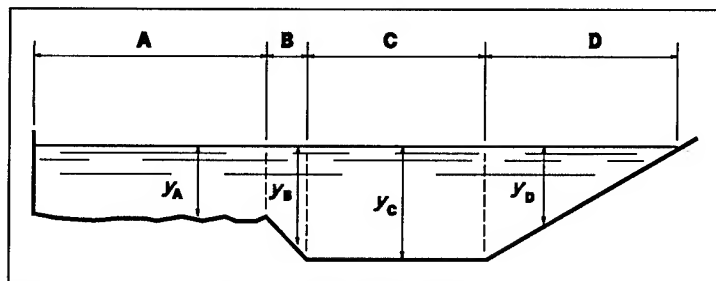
Typical Cross-Section Along an Arc of Radius x, Looking Upstream Toward Meldahl Dam
